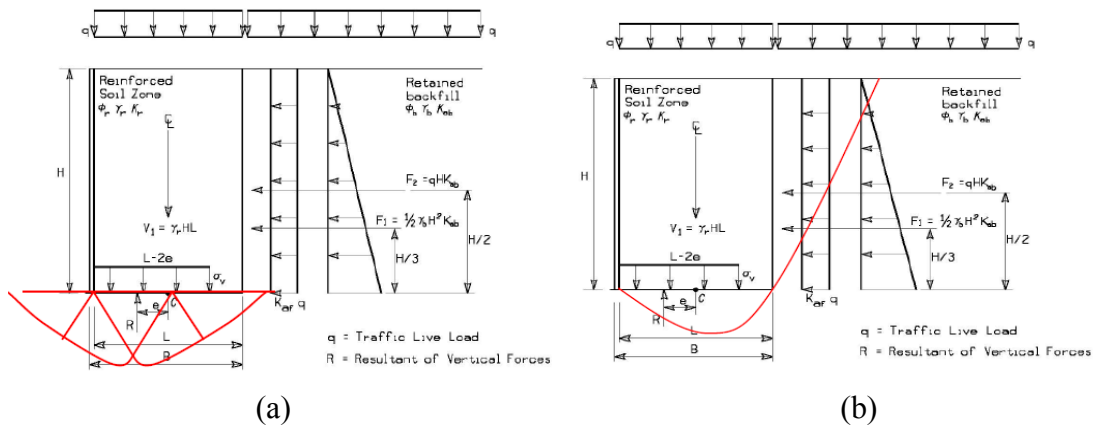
Bearing Capacity of Retaining Walls: (a) Assumed Bearing Failure Zone of Current Practice and (b) Possible Failure Zone.
